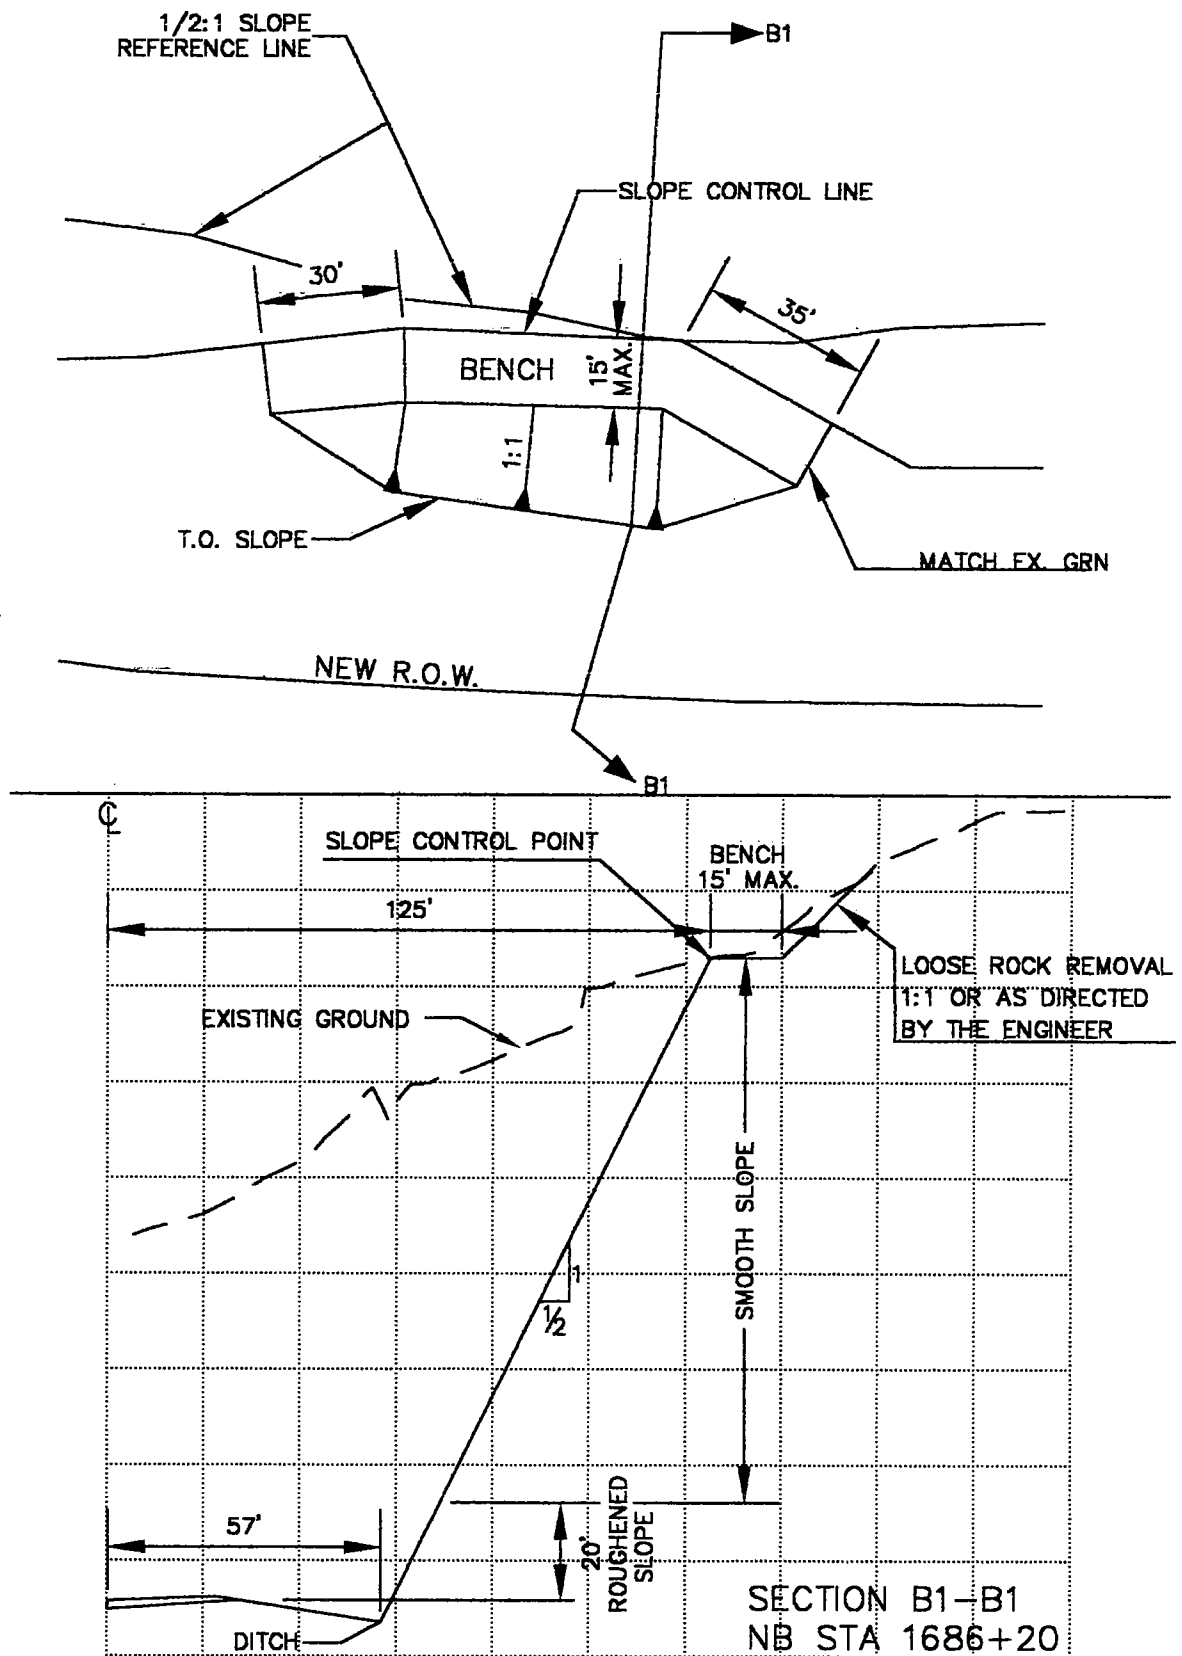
Typical cross section, modified, upper slope benches can be used for establishing vegetation. Note the slope control point.
